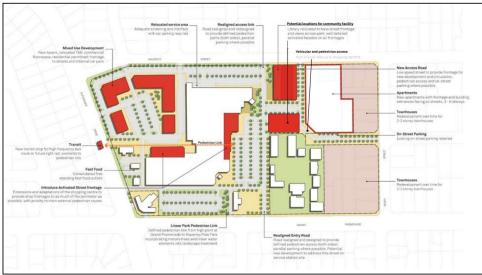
Dianella Centre Plan Figure 17 – Indicative Development Opportunities Plan
